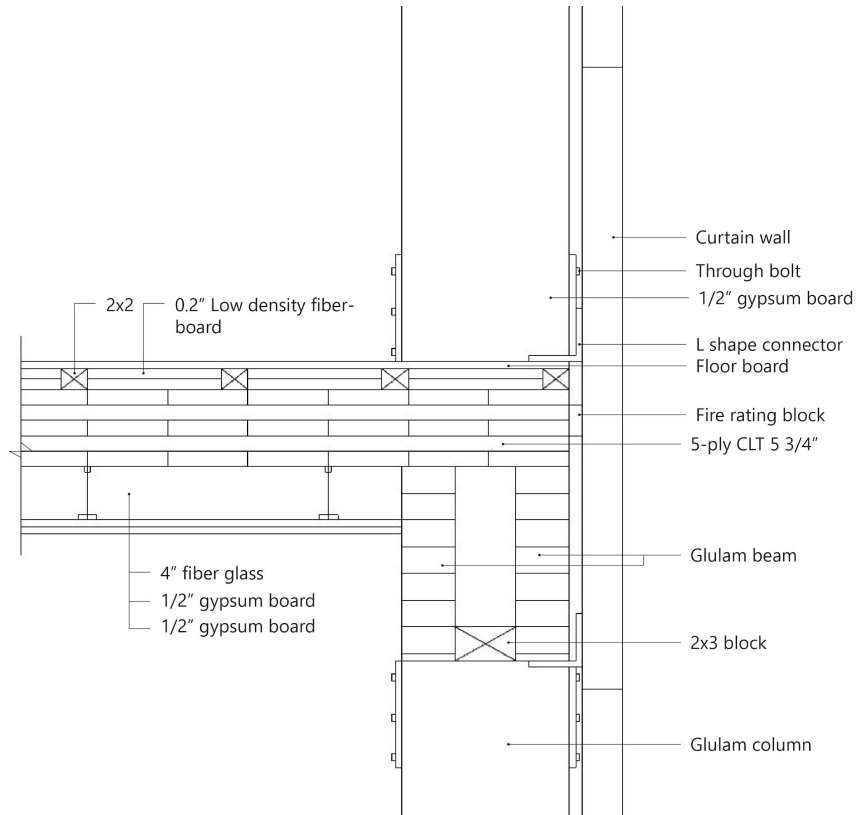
2.2) Exterior Wall Details, which demonstrates the exterior wall connection to CLT wall panels. Exterior wall / cladding is mounted on the CLT wall with an air and vapor barrier and insulation reference the CLT handbook. It is a conceptual design suggestion for the LP system.
